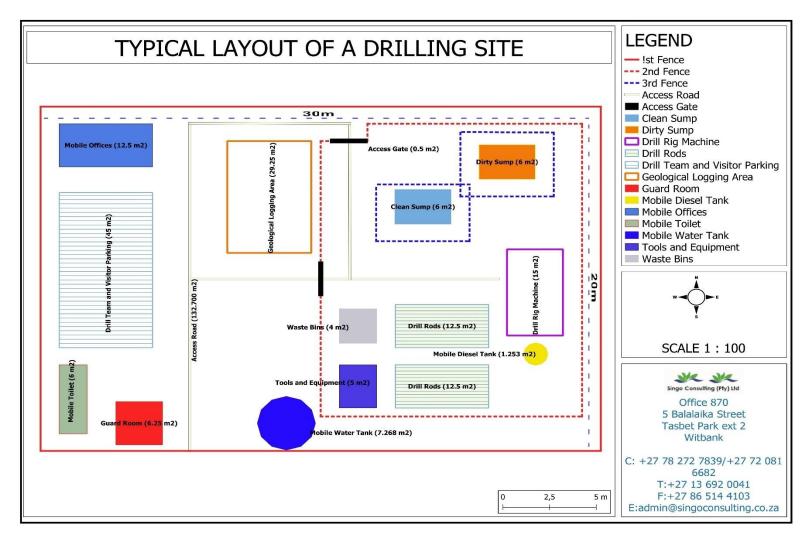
The drill site layout plan showing areas where specific activities will take place in the project area (Singo GIS, 2023)
